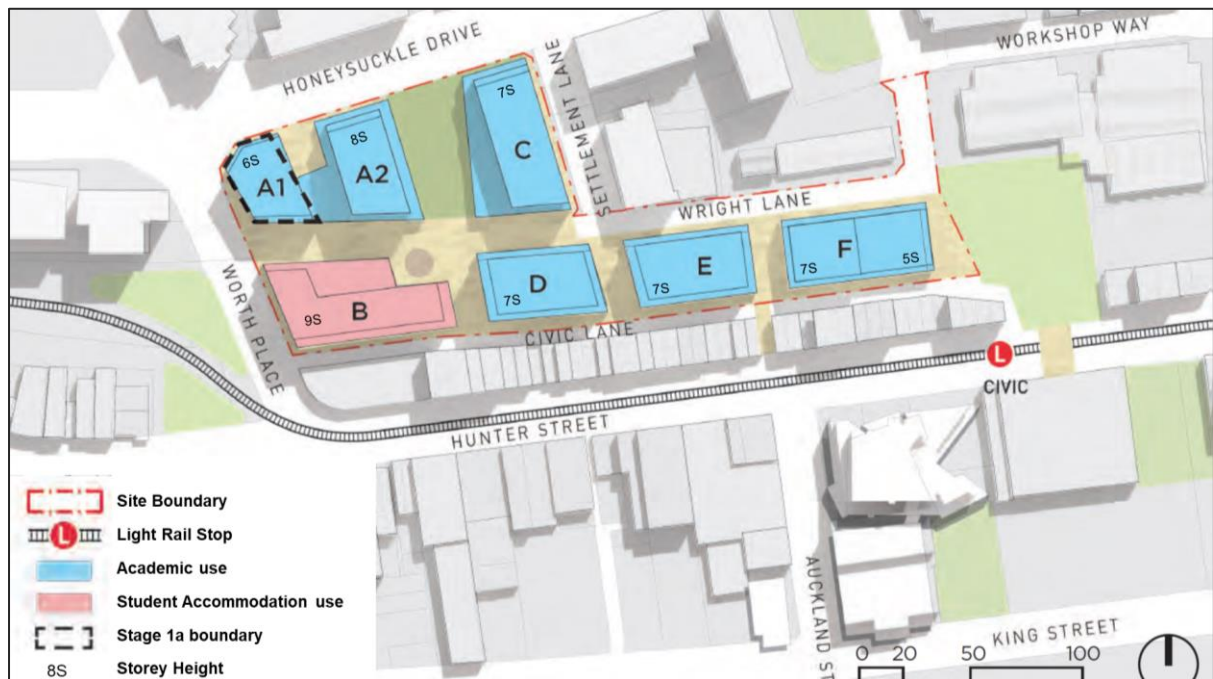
| Building envelope location and layout (Source: Applicant's SRtS)
